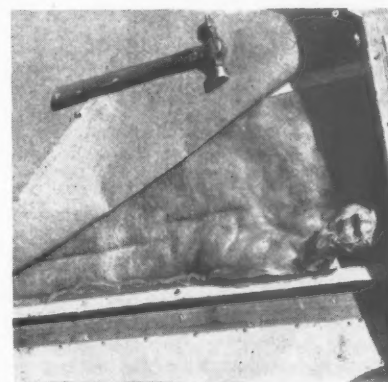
Glass wool insulation above fibreboard ceiling (Spooner House)
